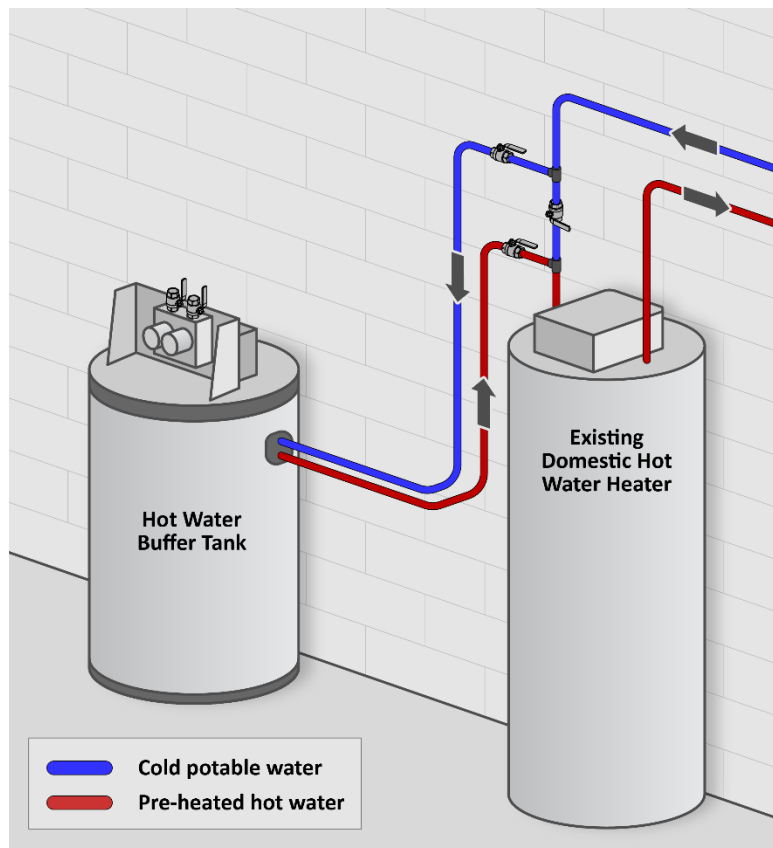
Recommended Domestic Hot Water plumbing arrangement
